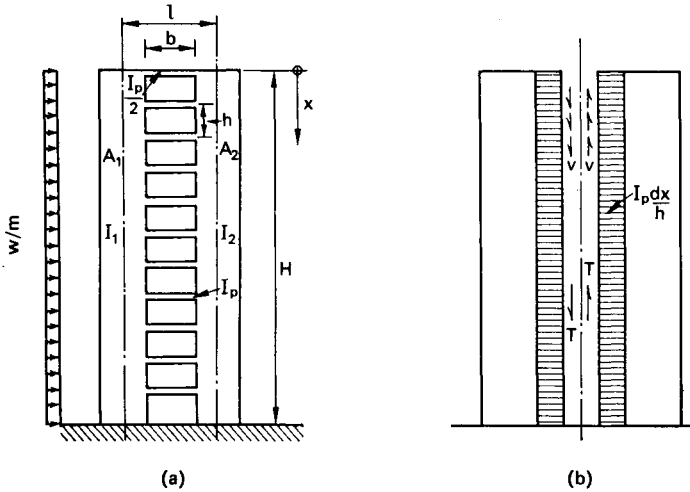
(a) Couple shear walls. (b) Individual connecting beams replaced by a continuous connection.
